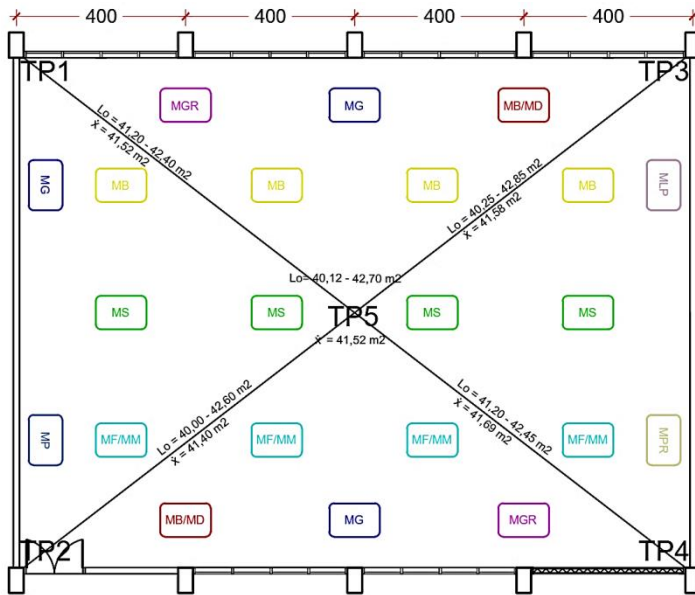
Layout Design of Machine Tool Unit Laboratory.
